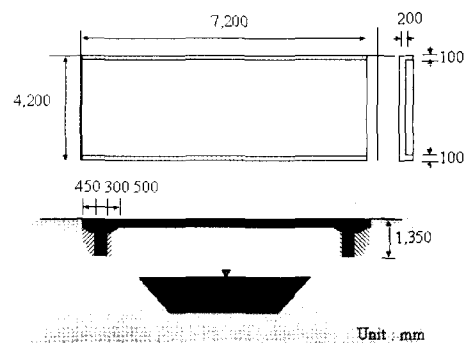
Plain view and profile of the rural bridge (photo by Kim¹²⁾)
